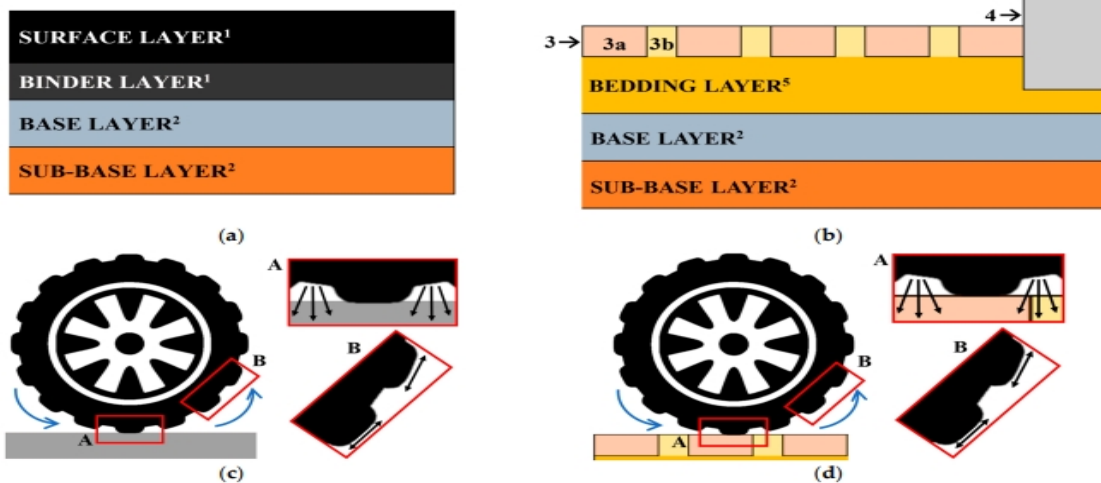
Interlocking Concrete Block Pavement (ICBP) and Asphalt Pavement (AP) in terms of layers and contact with the traffic load from taken from [3]). 1 Asphalt concrete (AC); 2 Aggregates with continuous gradation; 3 Top layer; 3a Concrete paving blocks (CPBs); 3b Material for joints; 4 Side restraint at the shoulder's edge or at the sidewalk controlled and sand material. (a) AP layers, (b) ICBP layers, (c) AP surface layer. (d) ICBP surface layer.
